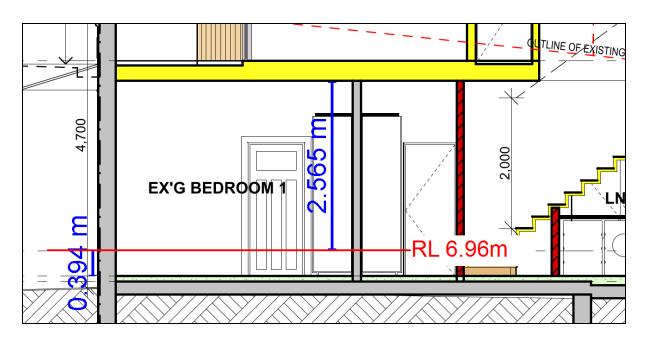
Extract from section showing internal ceiling height in relation to required floor level
